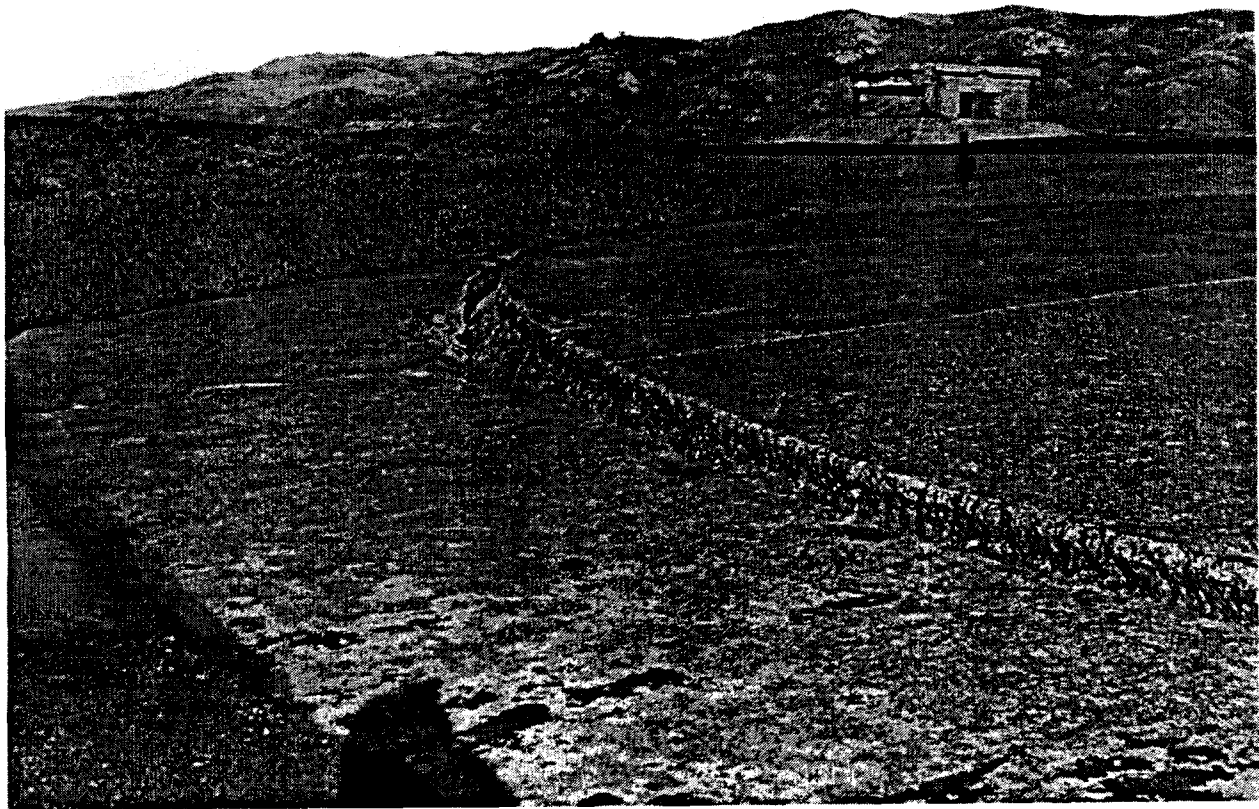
Battery Mendell. Looking North to BC station from front of emplacement two, showing separation and subsidence of blast apron from concrete mass.
